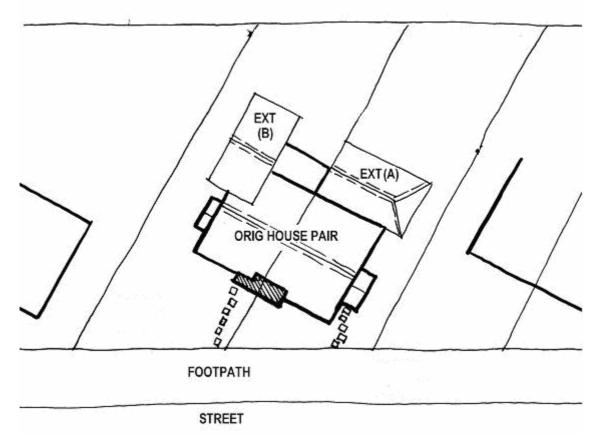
Plan view of extensions at the rear of diagonally placed dwelling pairs.
